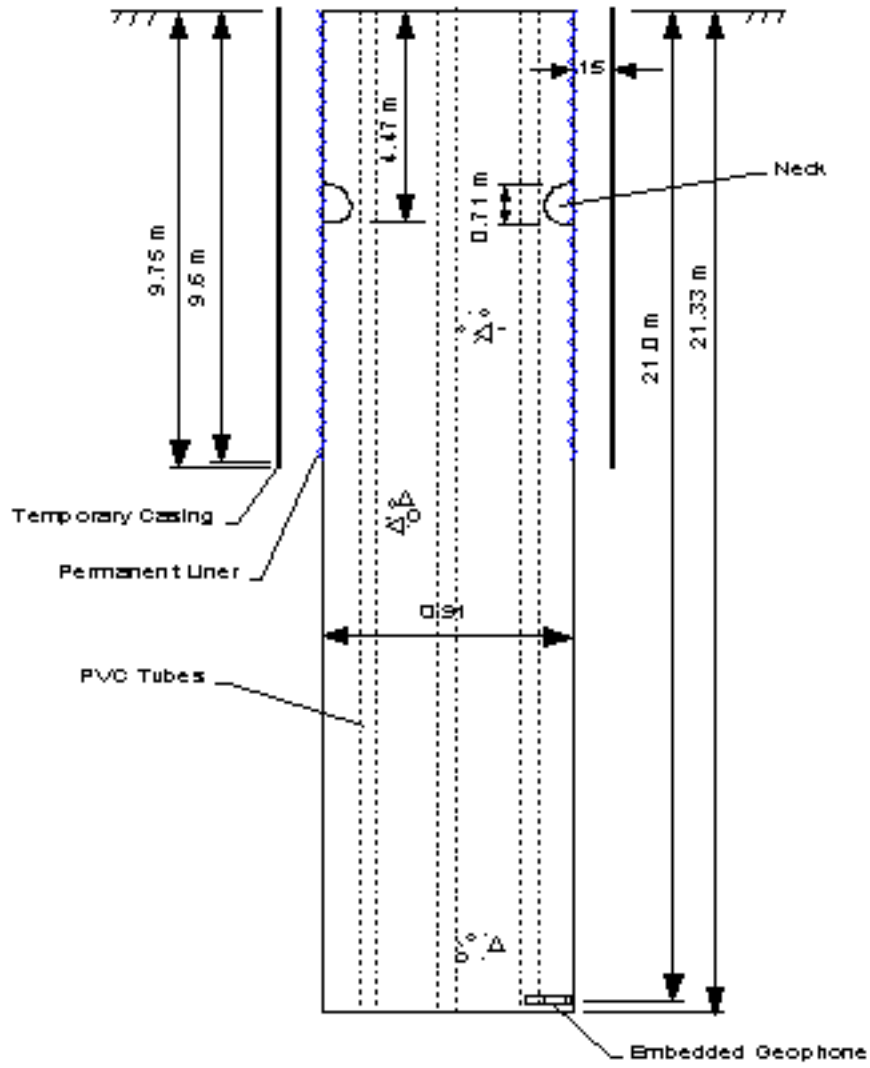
Detailed Schematic of Shaft 2 - Accessible-Head Condition
